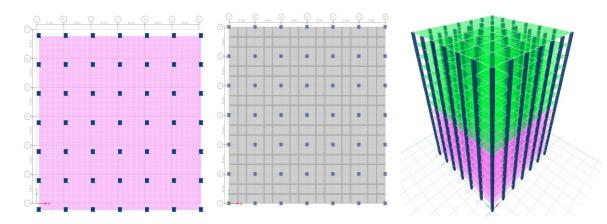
a. Plan view from Ground storey to 7th storey, b. Plan view from 8th storey to 15th storey and c. Elevation view of model FS+GS
